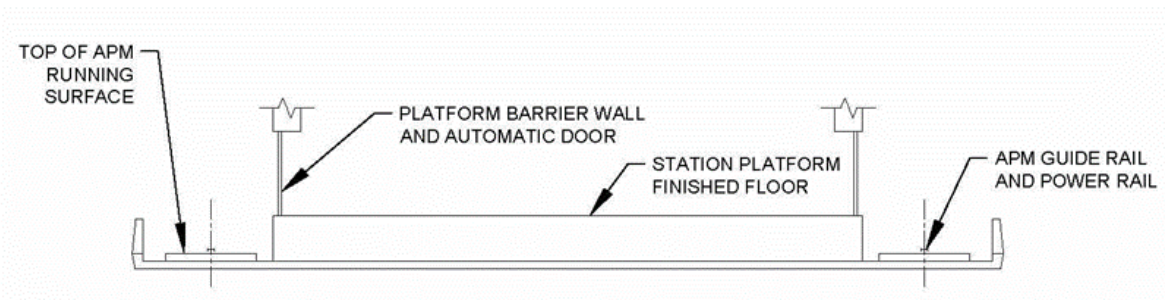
Existing Skylink Guideway Cross-Section at Stations
